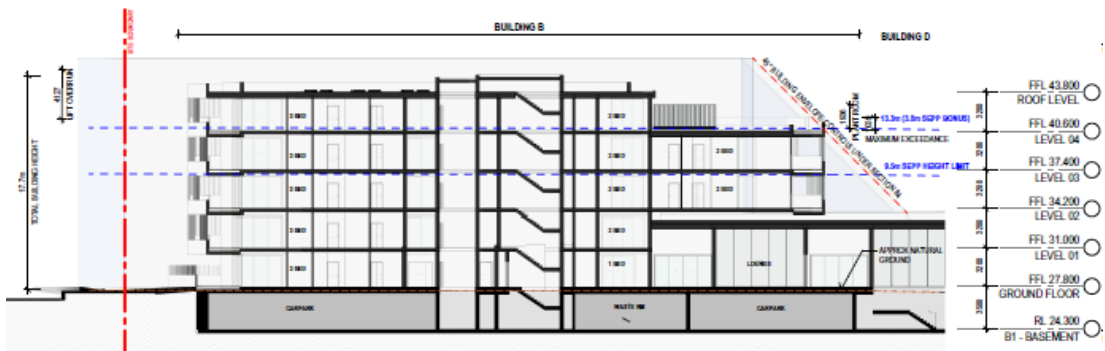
Proposed Building B Section 84 Building Envelope Compliance (Jackson Teece)
